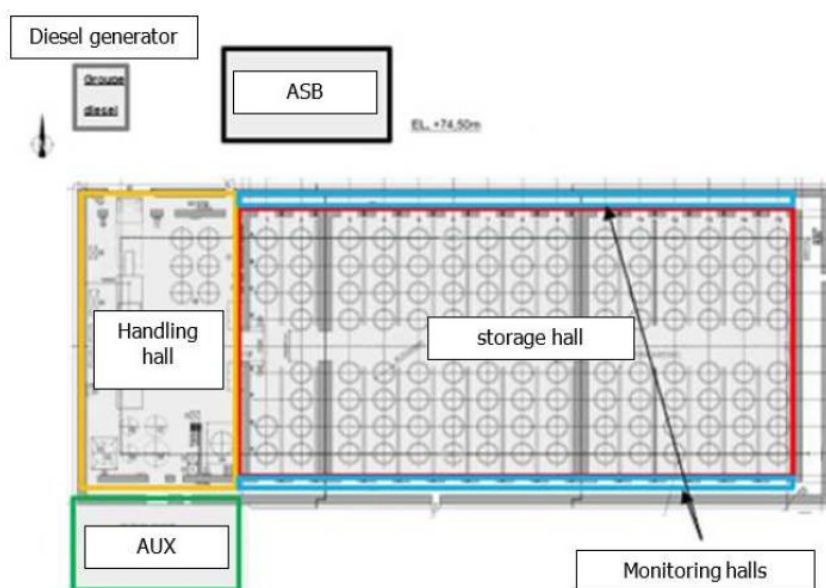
Global layout of the SF² facility (illustrated: facility at Tihange site).
